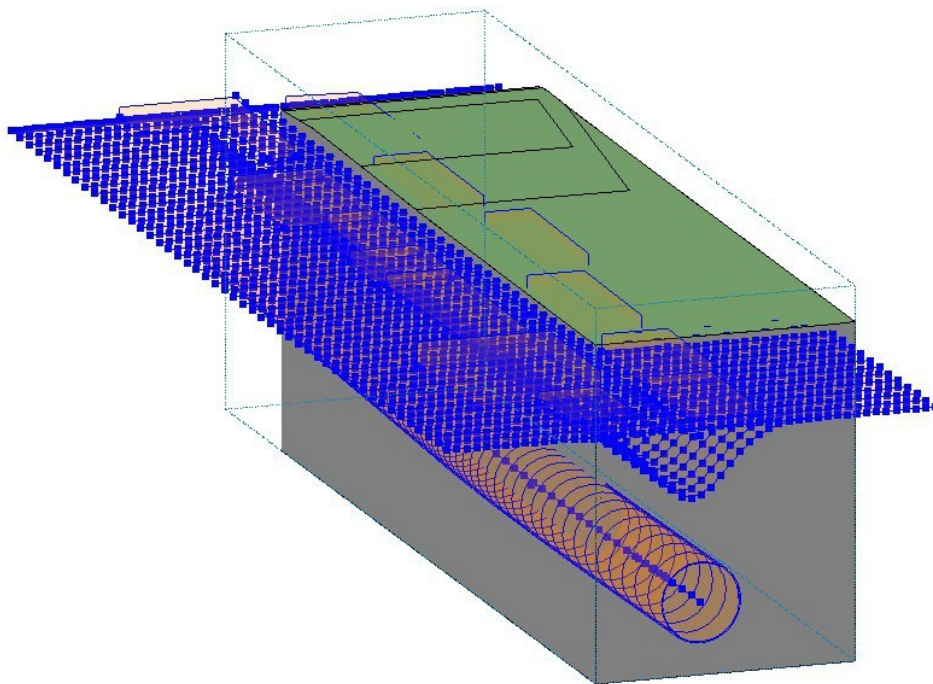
Tunnel geometry and deformed terrain transferred to Autodesk Revit [3D]
